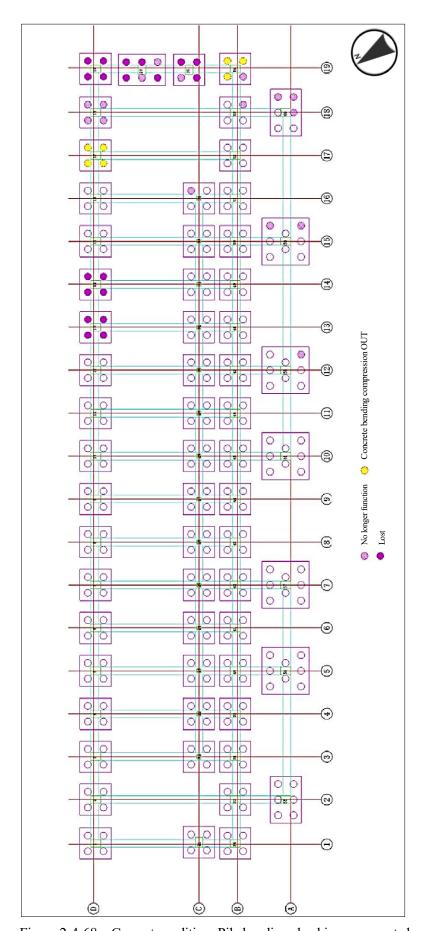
Current condition: Pile bending checking – concrete bending compressive stress OUT parts
